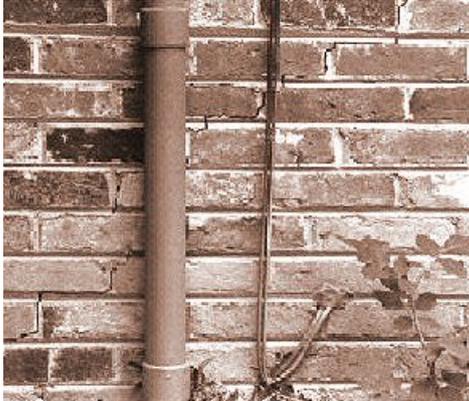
A common masonry wall crack probably caused by thermal or moisture expansion. [81]
